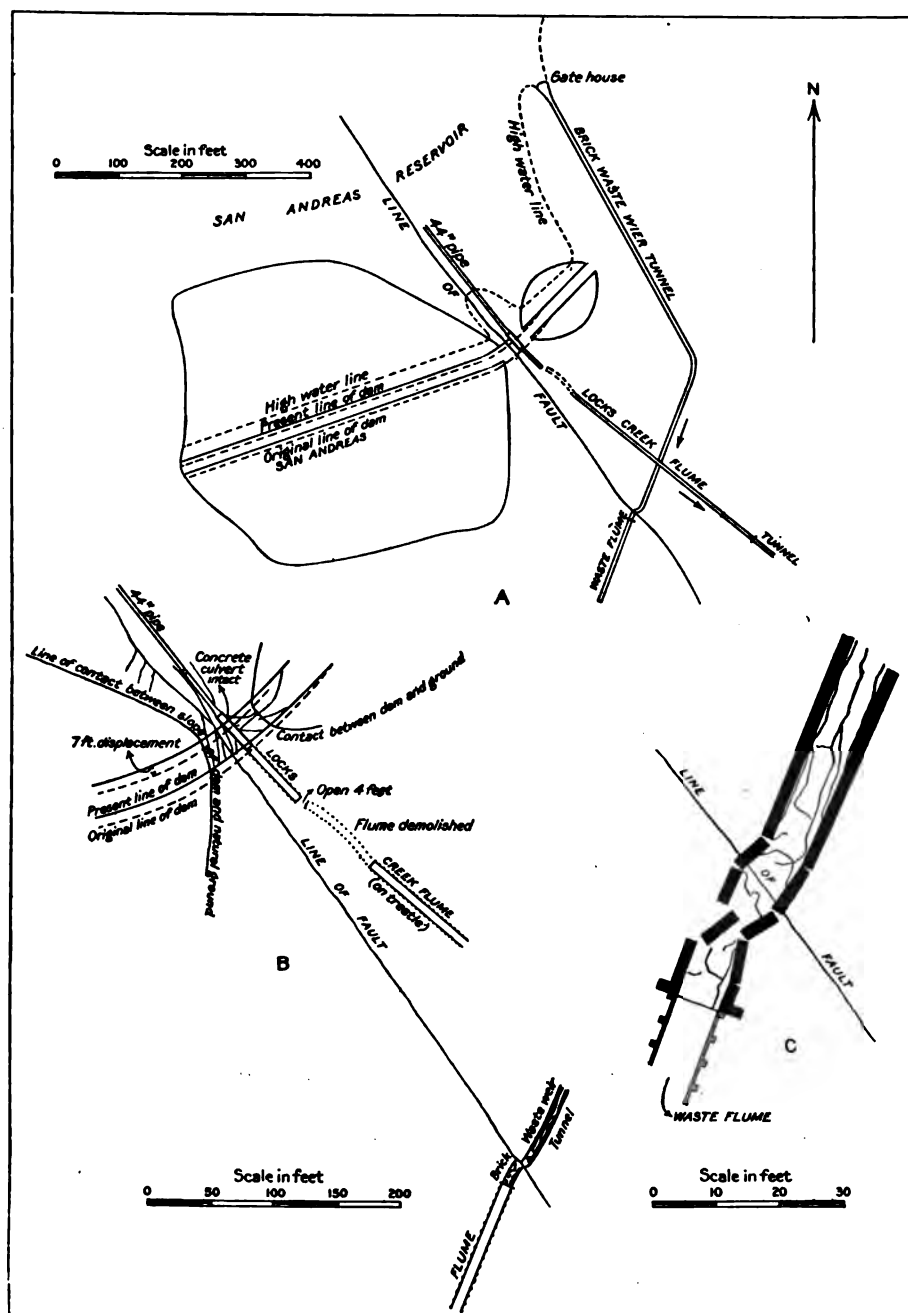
Intersection of San Andreas dam by fault. A. Plan of dam in two parts, with rock between. B. Relation of dam to waste weir tunnel. C. Detail of waste weir tunnel.
